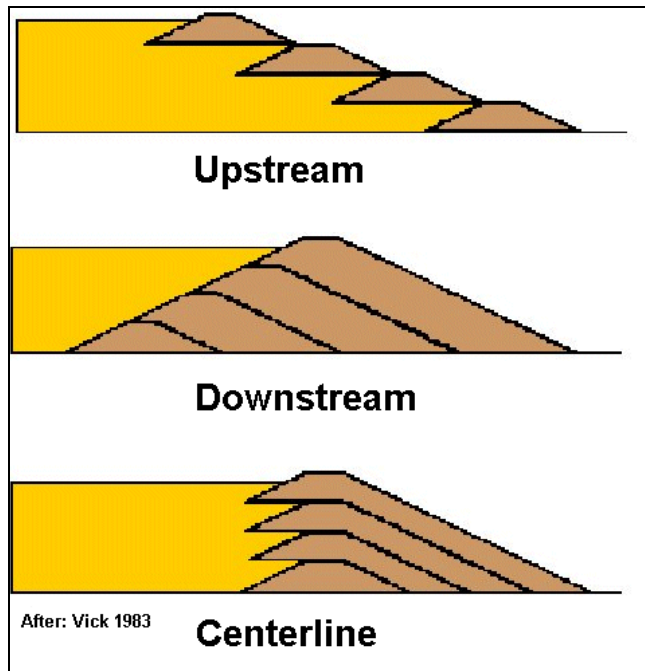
Types of sequentially raised dams with tailings in the structural zone [11, EPA, 1995]
